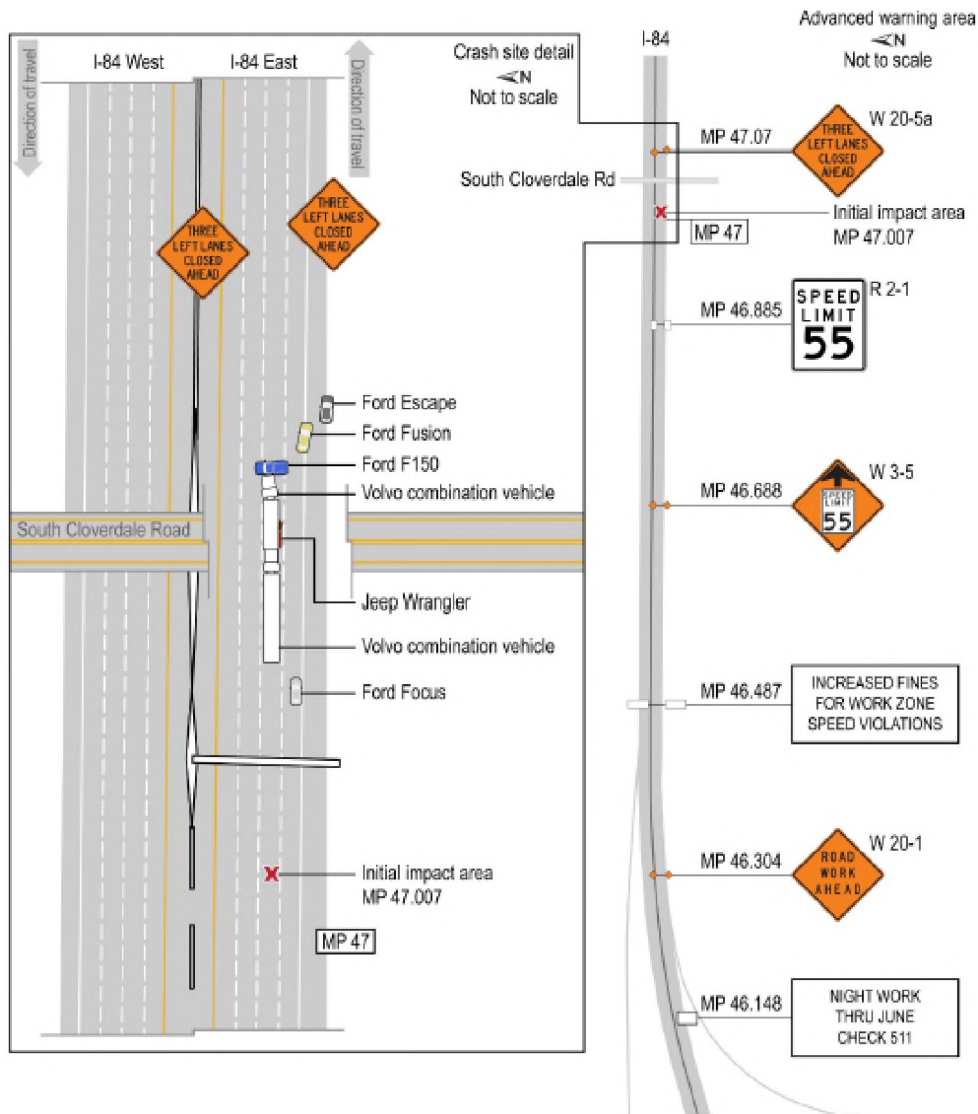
Advance Warning Area of Work Zone with Crash Site Detail
